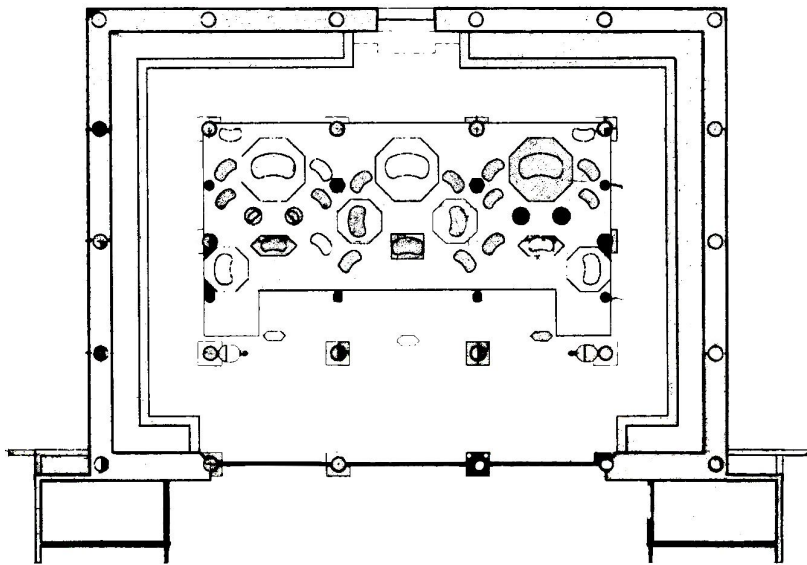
Floor Plan of the Bojia Buddhist Canon Hall
